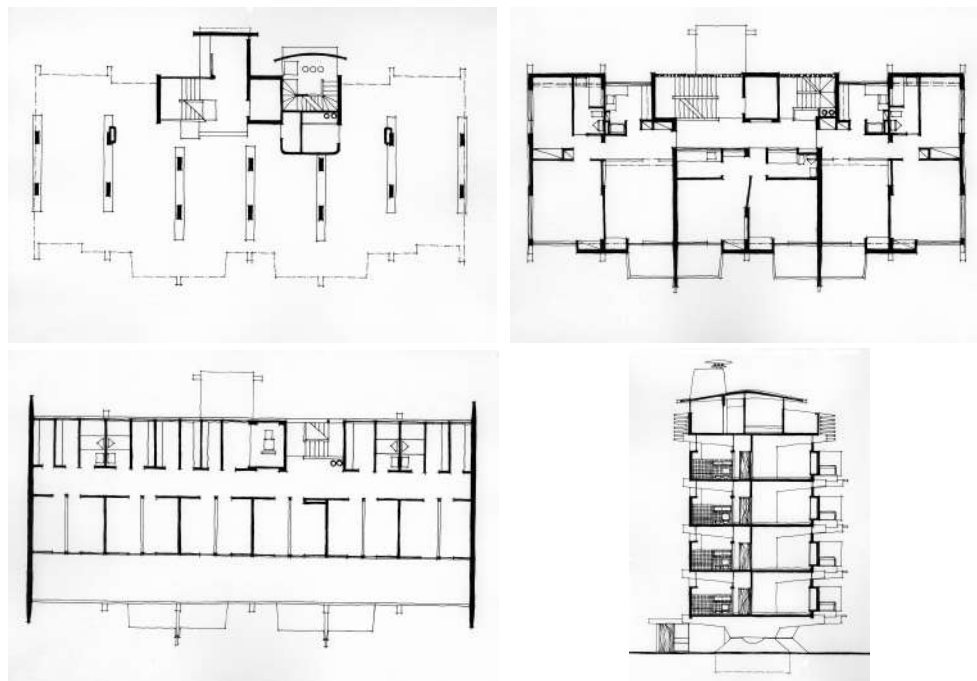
Ground floor, typical floor plan, top floor and section of Prometheus building.
